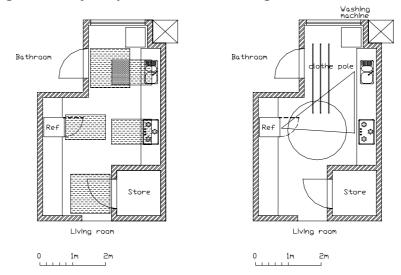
Floor layout analysis of Kitchen 8687-02, layout 1.
